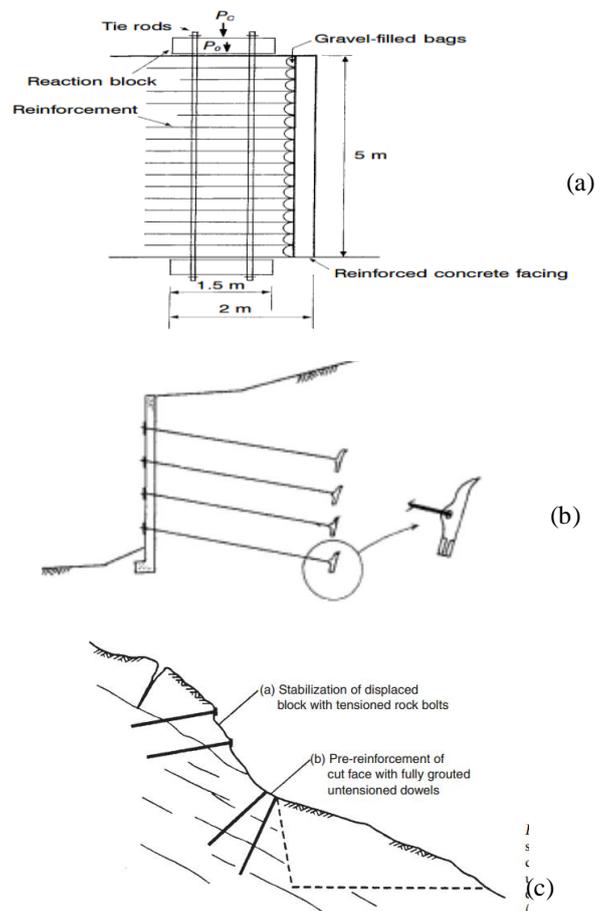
Examples of metal reinforcement in geotechnical engineering - a. foundation embankment [2]; b. earth retaining wall [3]; c. rock slope [4].
